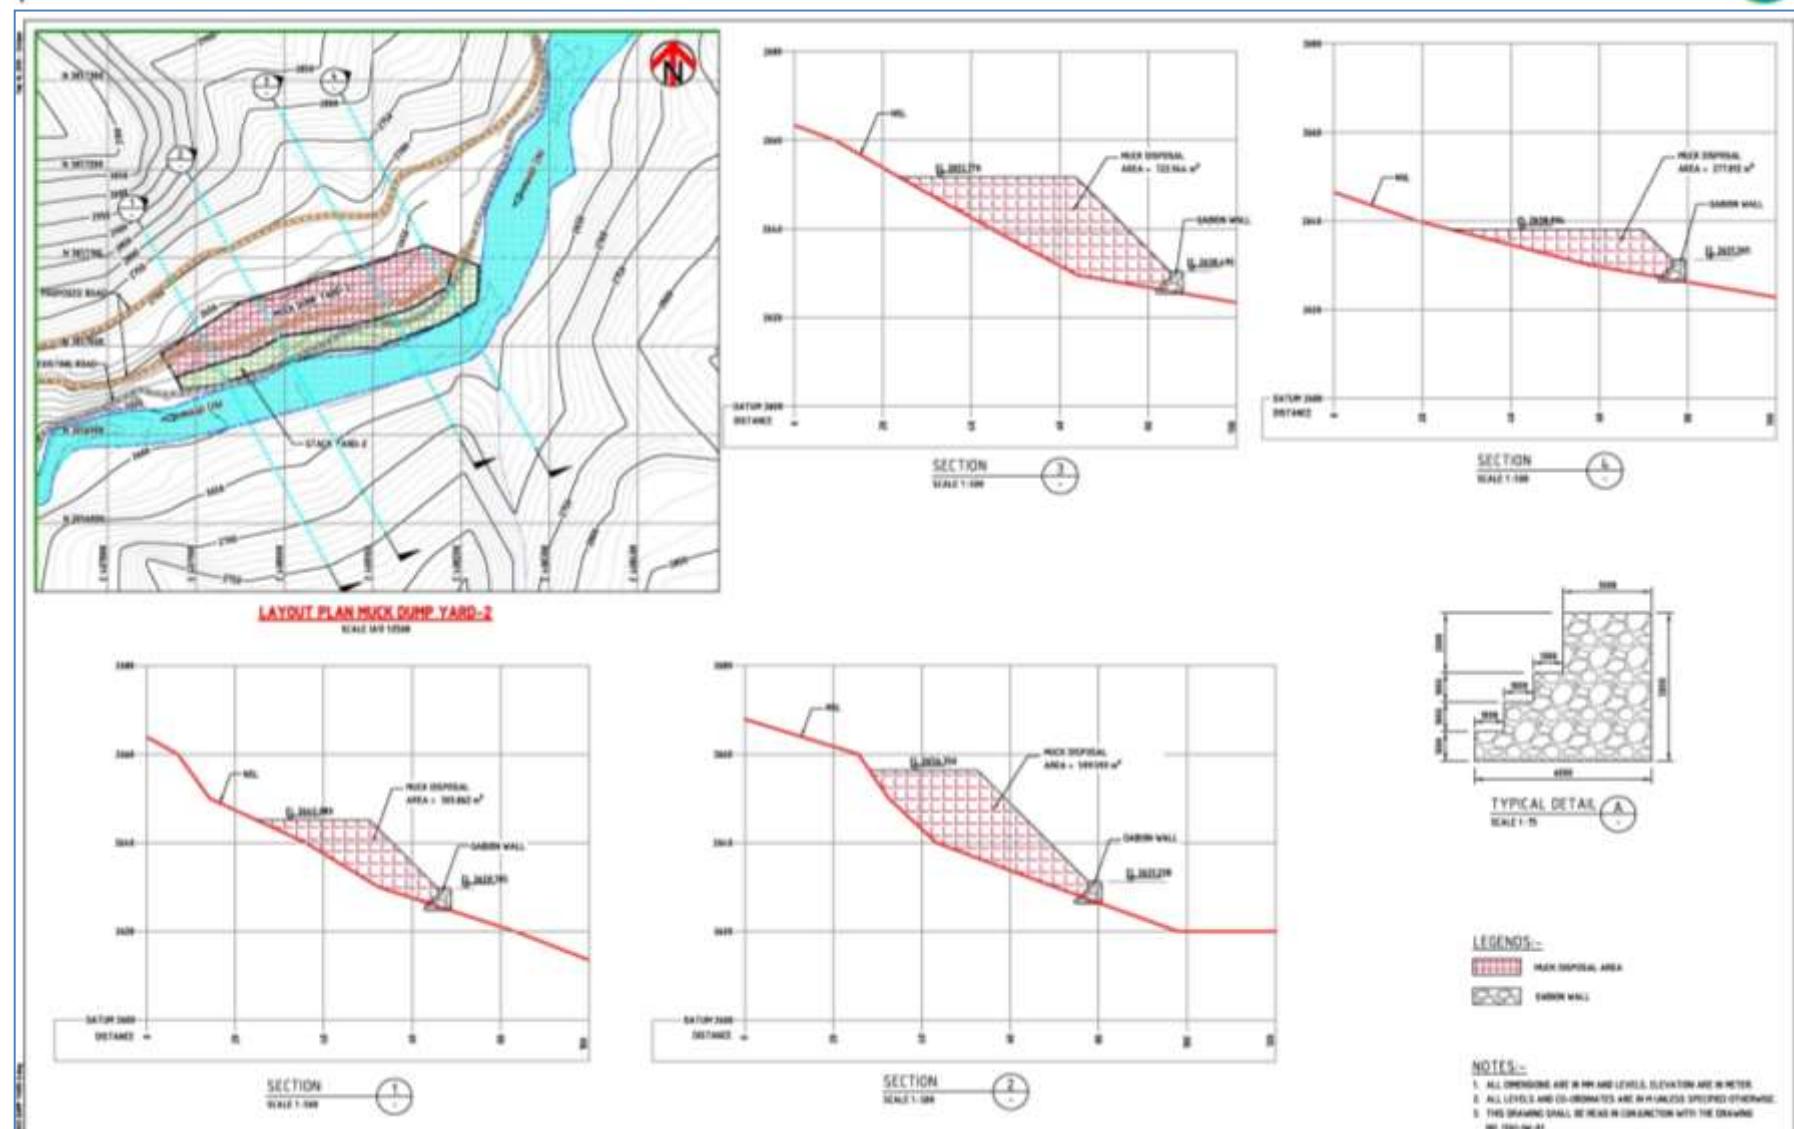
Layout Plan of Muck Disposal Site - 2
